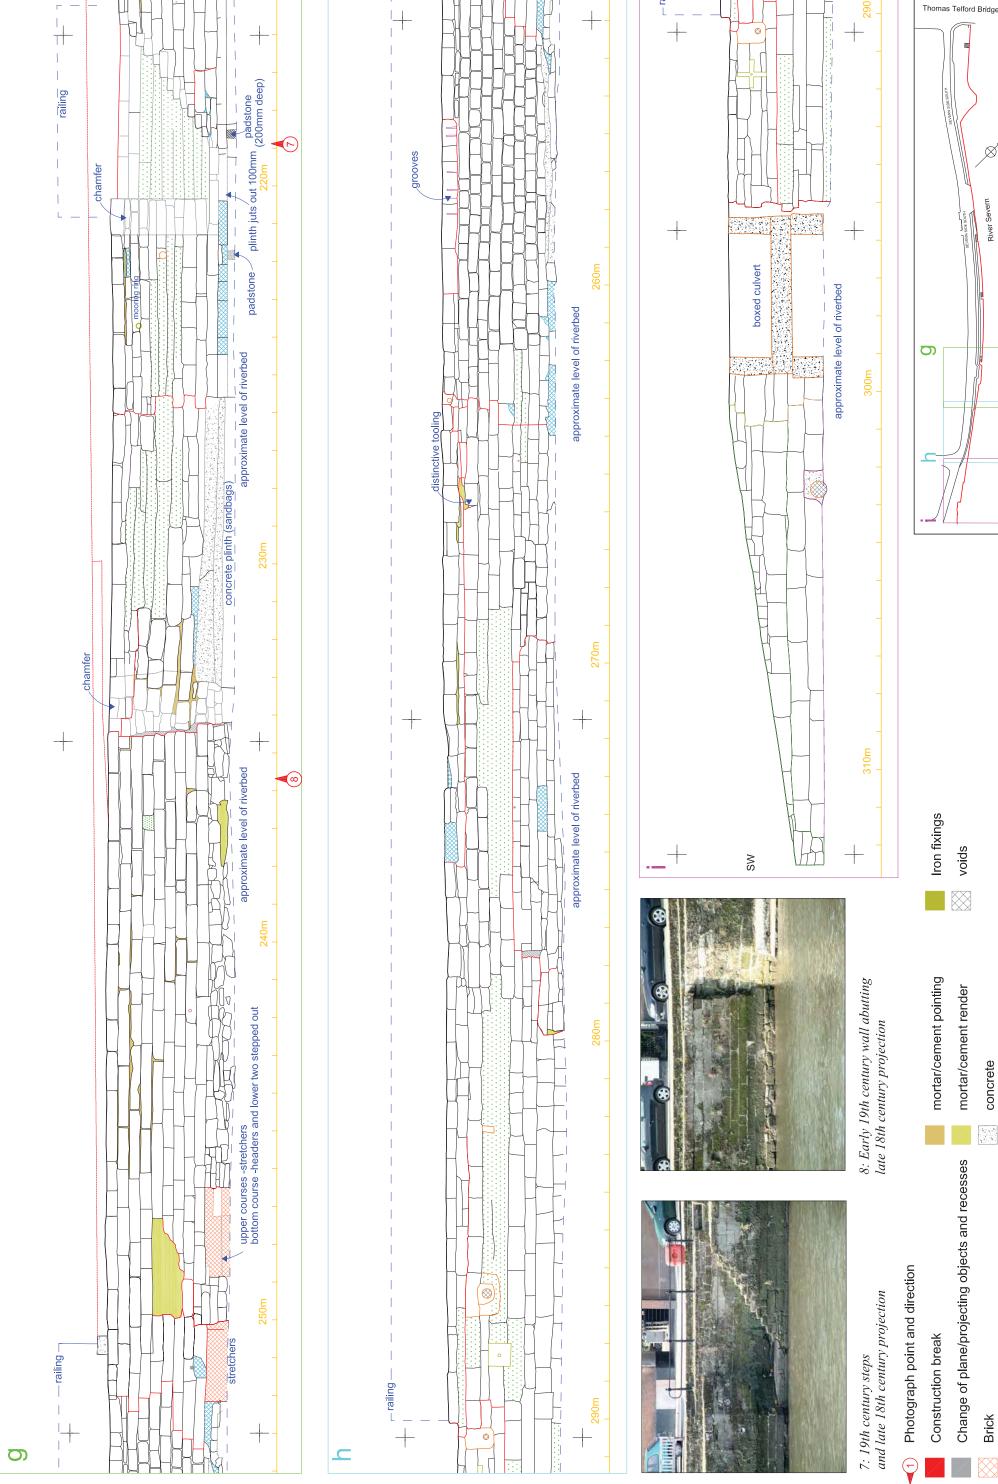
(iv): Elevation of quay wall - (divisions g, h and i)
